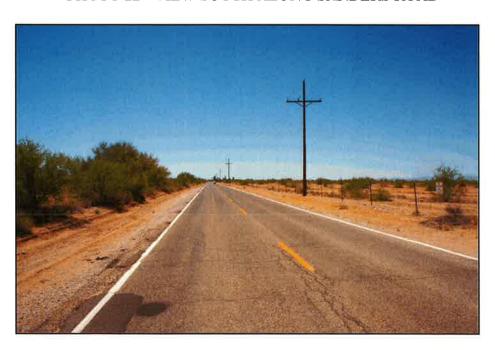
VIEW WEST ALONG EMIGH ROAD
